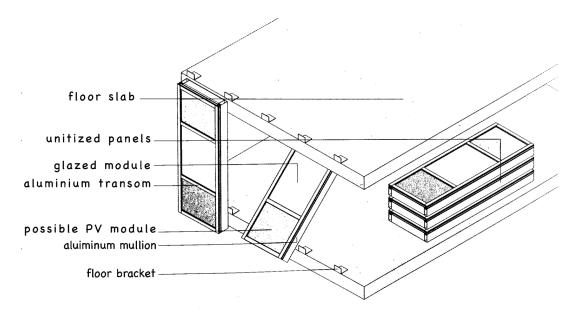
Unitized curtain walls system onsite storage and installation Source: Roberts & Guariento, 2009
